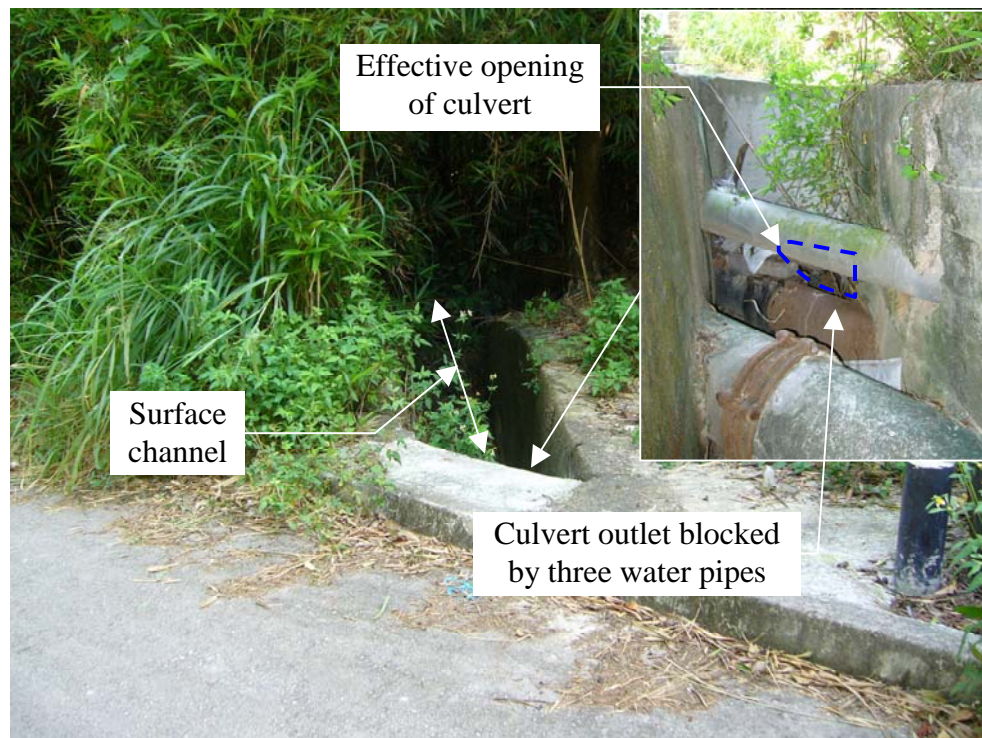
View of the Surface Channel and the Outlet of the Cross-road Culvert (Photograph taken on 9 October 2007)
